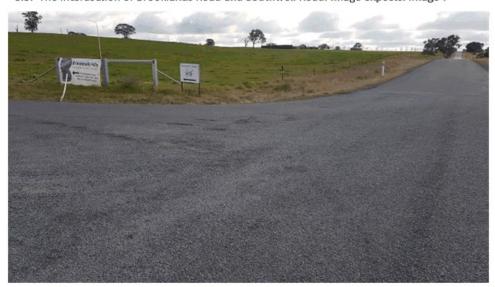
Junction Southwell and Brooklands - pavement thinning and failure – looking Northwest
